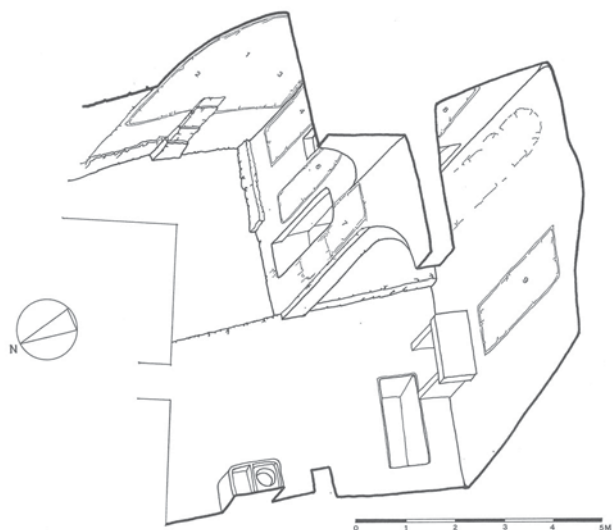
Madonna delle Greca Church. Section and plan. (survey: C. Crescenzi, M. Scalzo, 1982)
